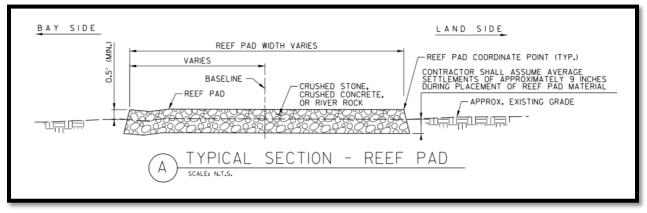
Typical Section of HSC DER Reef Pads Currently Assumed as NED Plan Pad Design
